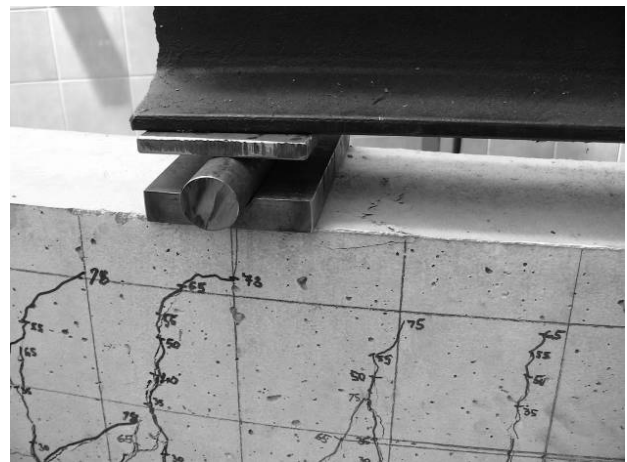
Concrete crumbling in the area of application of force (near the supporting slab) / Zdrobirea betonului în zona de aplicare a forței (lângă reazem).
